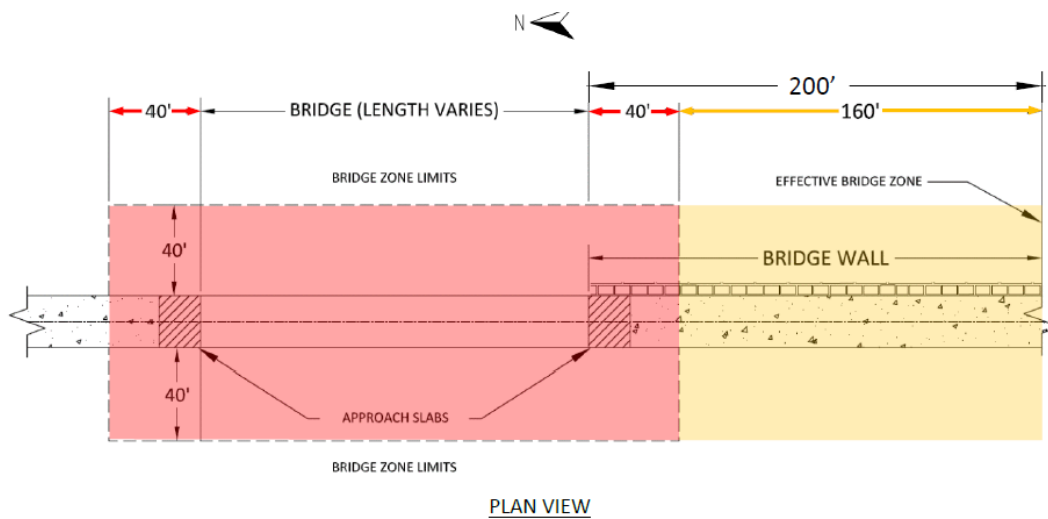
Effective Bridge Zone (from Walters et al. 2016)
